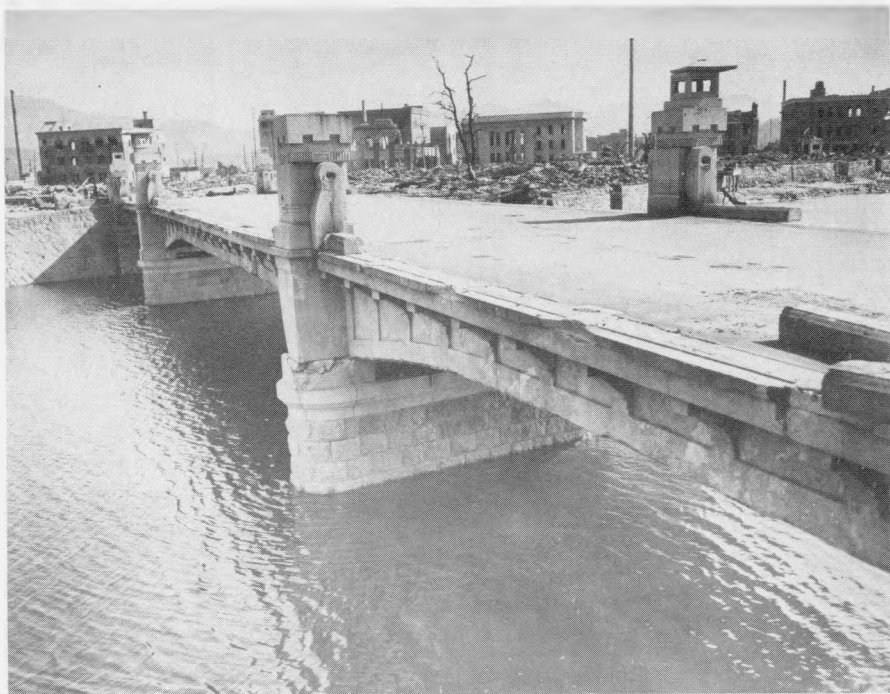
Bridge with deck of reinforced concrete on steel-plate girders; outer girder had concrete facing (270 feet from ground zero at Hiroshima). The railing was blown down but the deck received little damage so that traffic continued.
